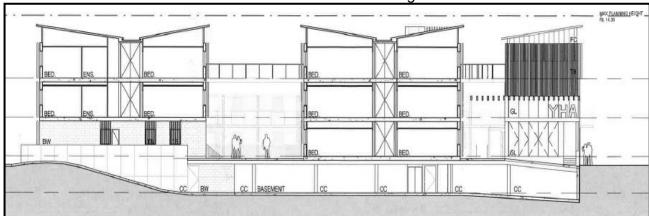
Section drawing of proposed development (showing basement car park and three storeys above)
